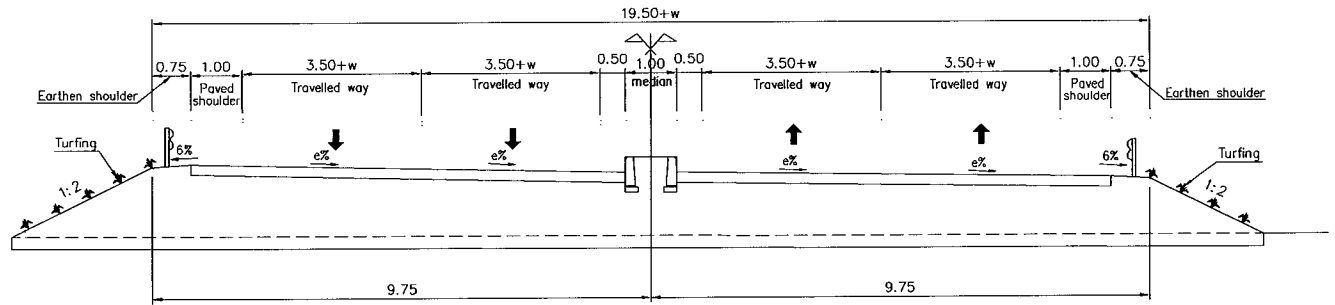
Typical Cross Sections of Interchange Ramp Way (2 Direction 2 Lane)
